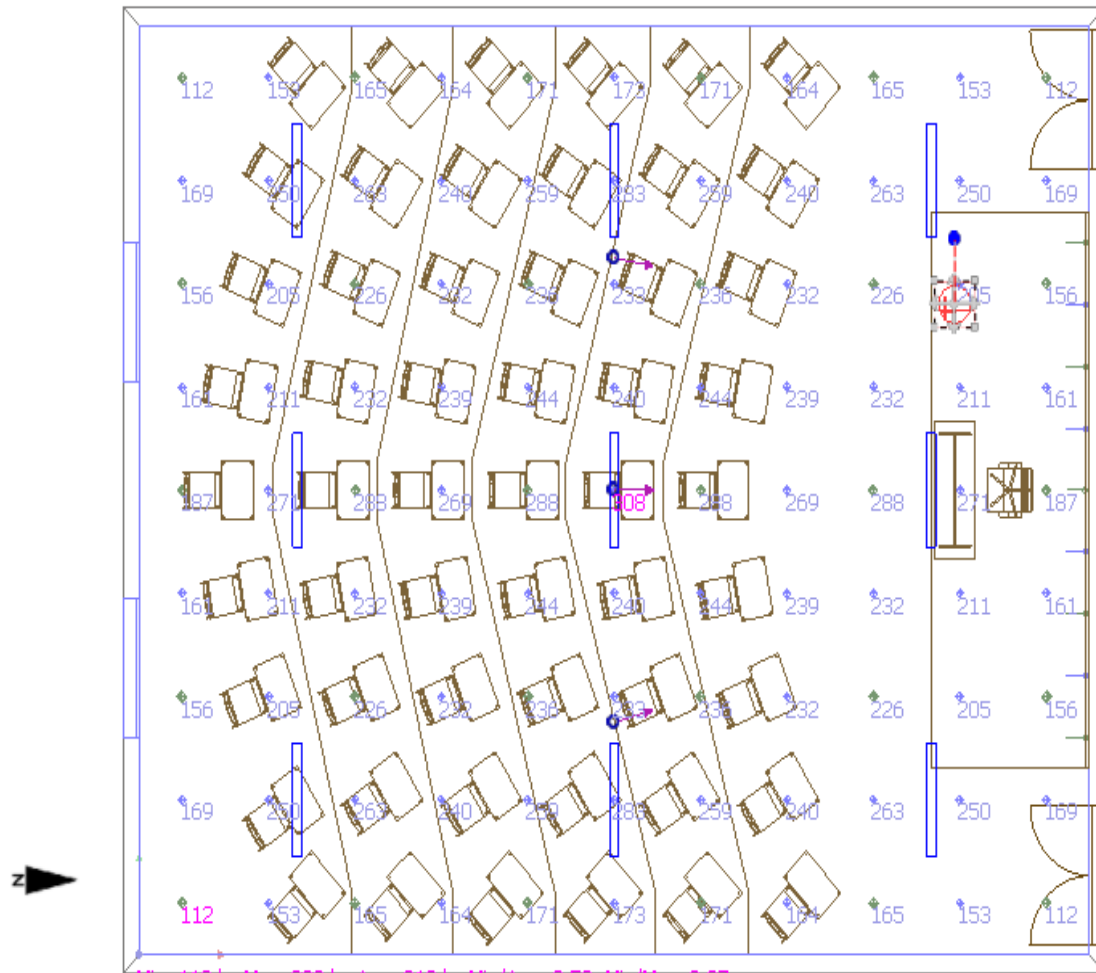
2D View of Overall Floor Plan of Classroom
